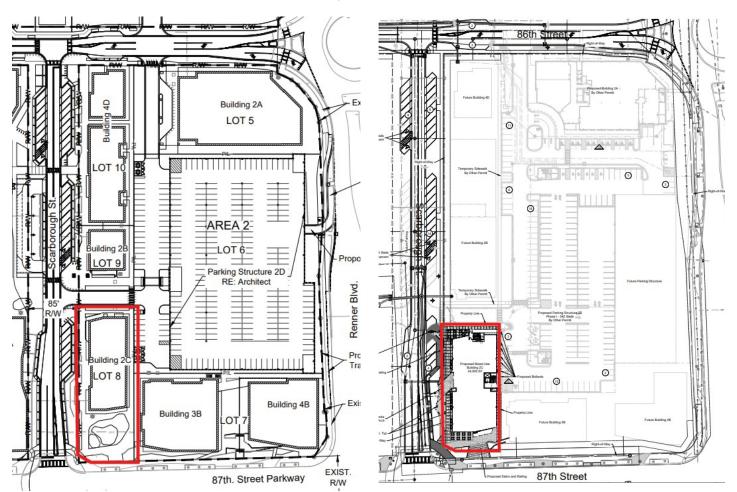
Building 2C on the Preliminary Plan for Area 2 of the Advent Health Life Campus.
